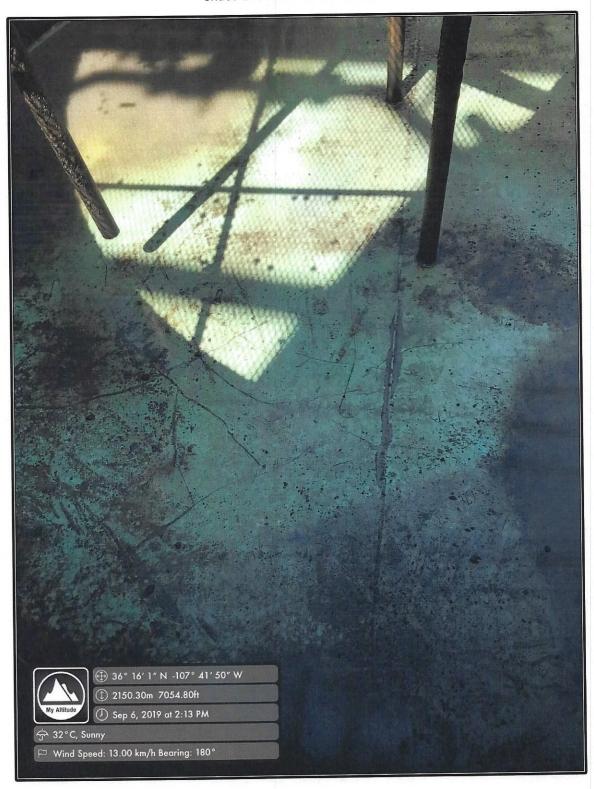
Picture of Pit Tank After Clean-Out (View 2)
